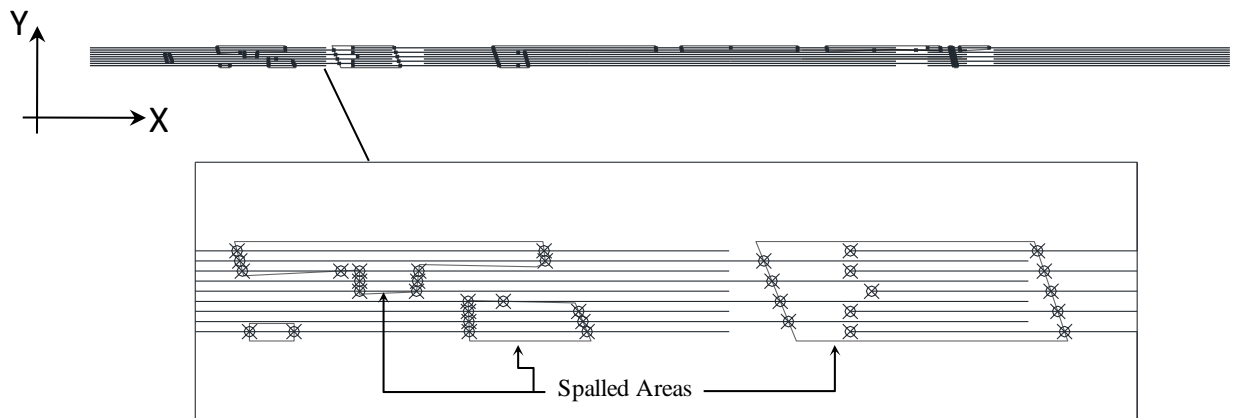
Reinforcement plan-spalling survey superposition for program input.
